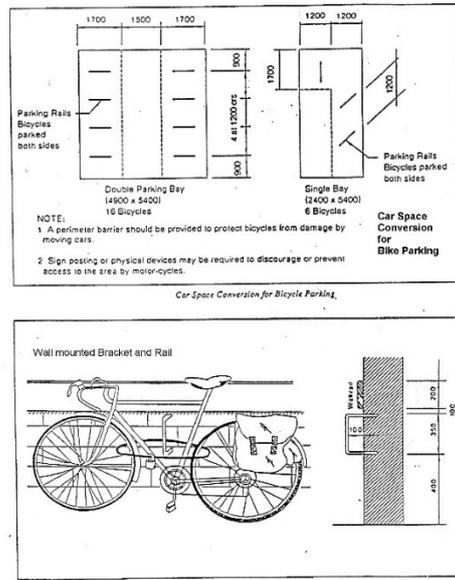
Car Space Conversion for Bicycle Parking and Wall Mounted Bracket Rail
